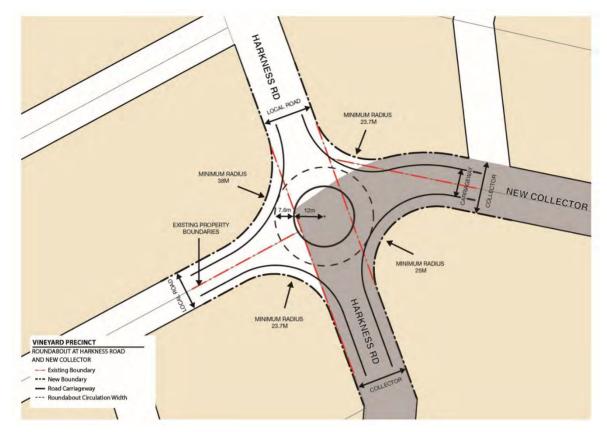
Indicative location and design of roundabout at Harkness Road and new collector road
